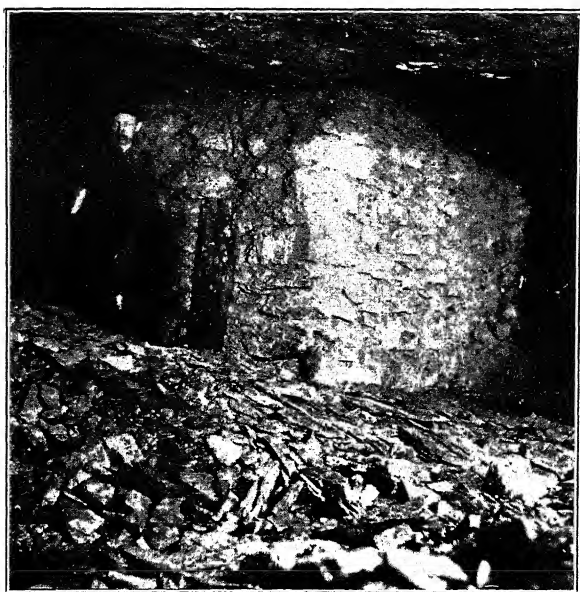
SANDSTONE AND CEMENT PIER UNDER NO. 15 SCHOOL.
